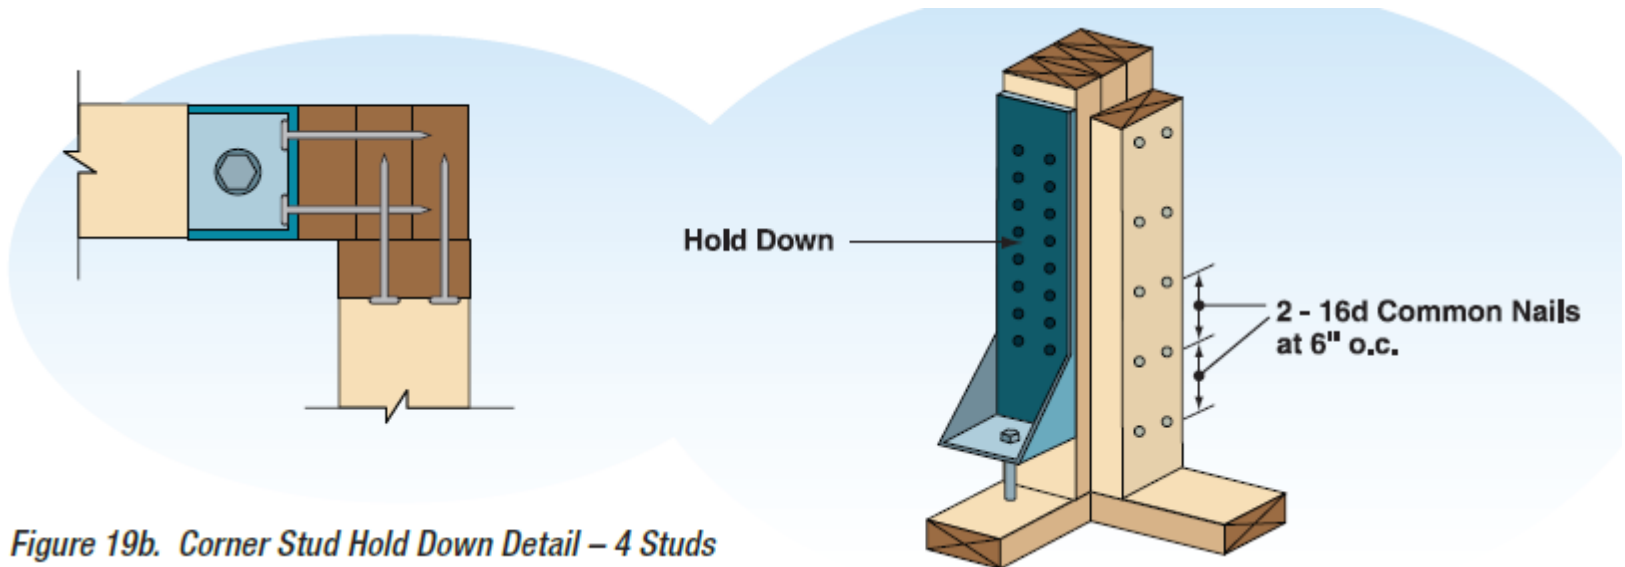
Corner Stud Hold Down Detail – 4 Studs
